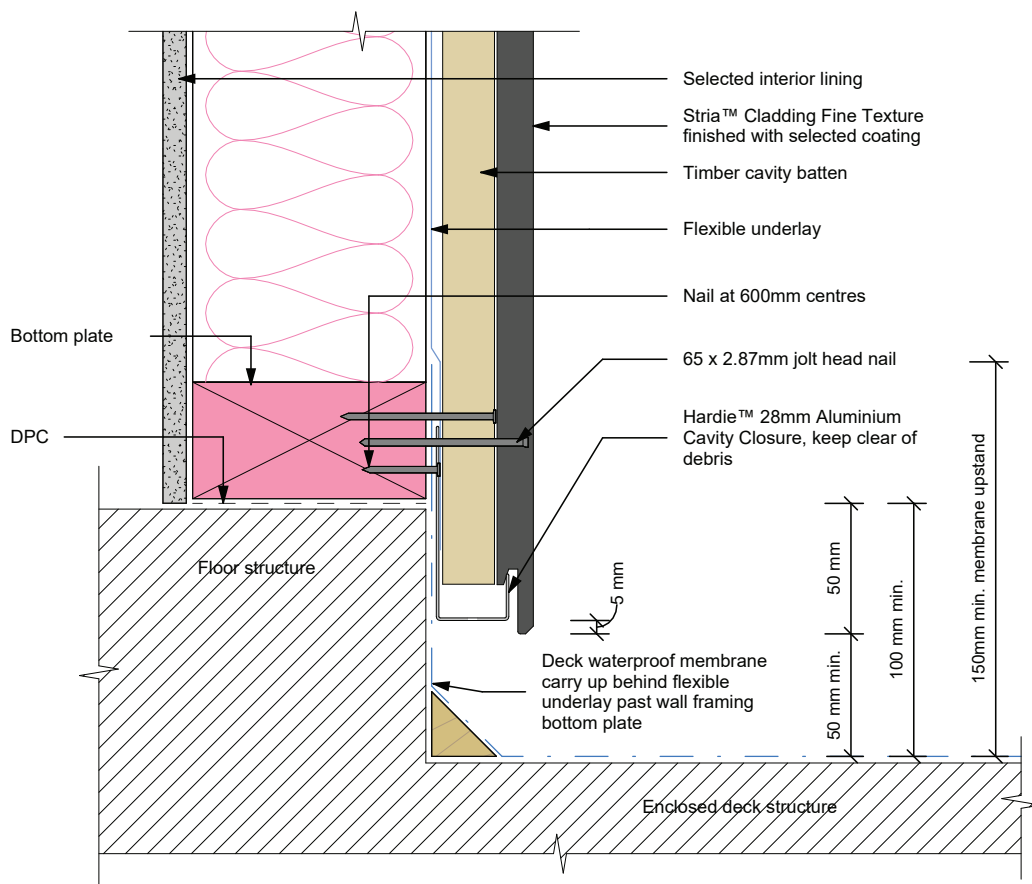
Cladding fixing up to VH wind zone with flexible underlay
